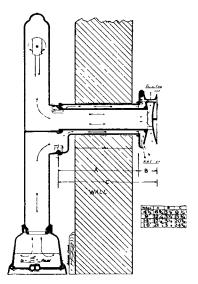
Cross Sectional Elevation showing Flue and Air Box.
